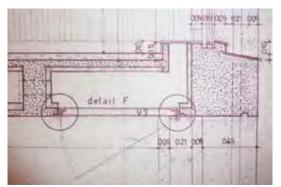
Detail section BB (Antwerp: deSingel)
